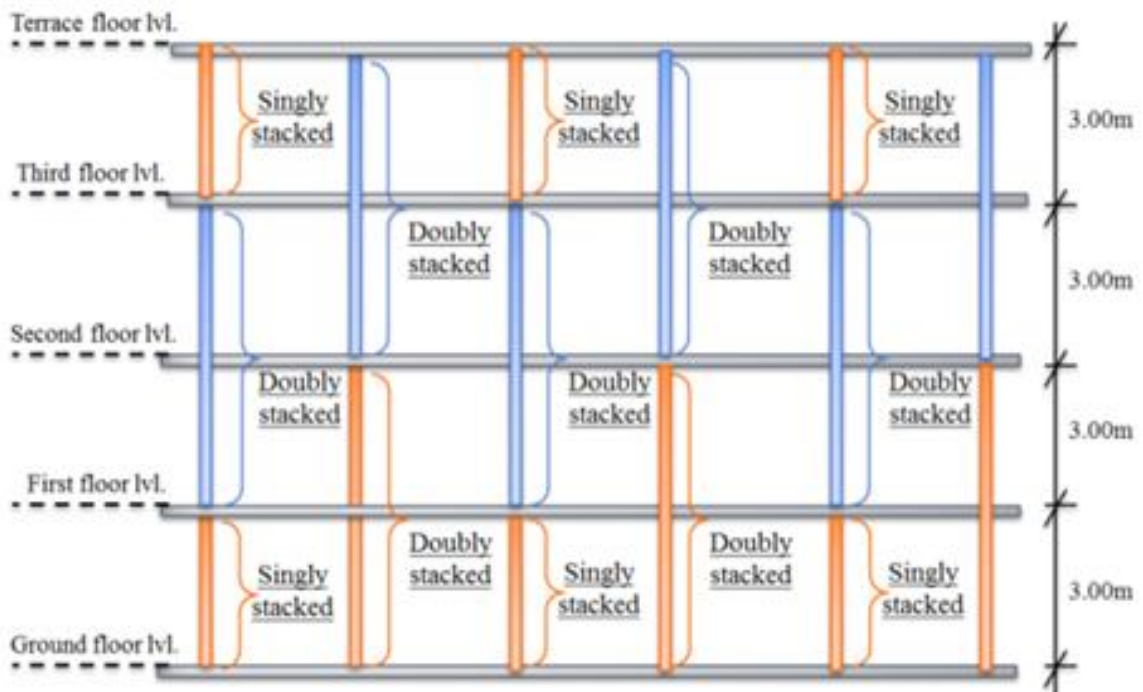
Columns Are Placed in an Alternative Arrangement of Single And Doubly Stacked Columns
